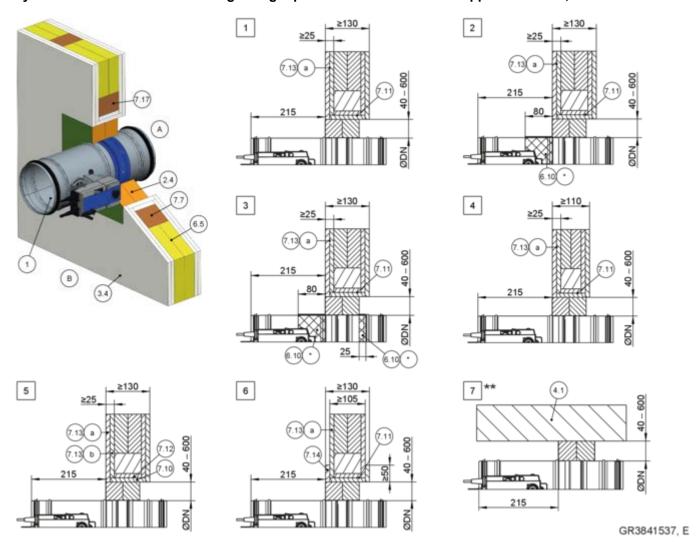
Dry mortarless installation into a lightweight partition wall with timber support structure, with a fire batt
